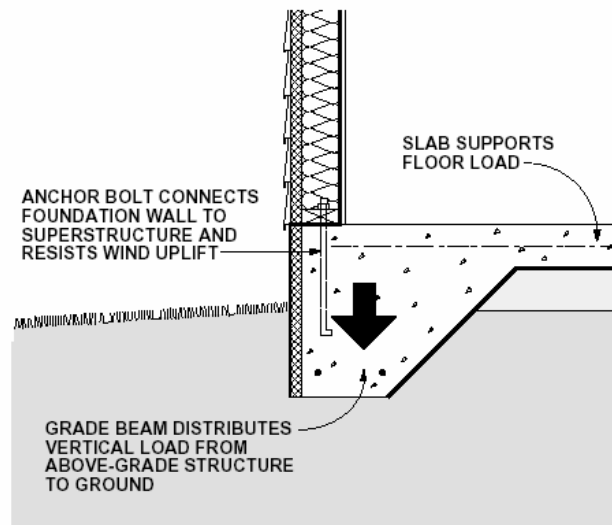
Structural Components of Slab-on-Grade Foundation with Grade Beam
